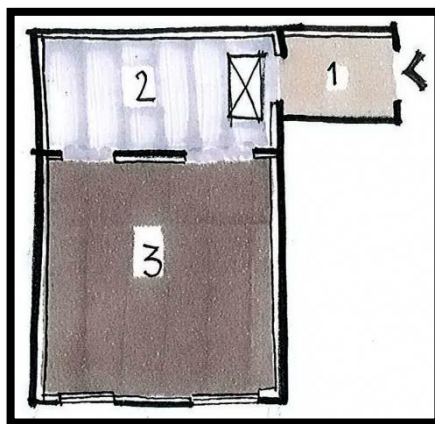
Nodrat house First Floor plan 1.Choghom 2. Someh 3.Big Room(by author)
